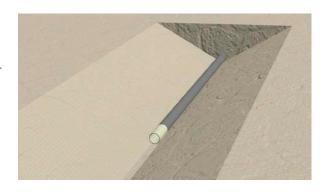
Cross-section of a trenched pipeline section. (Ramboll 2013a)
